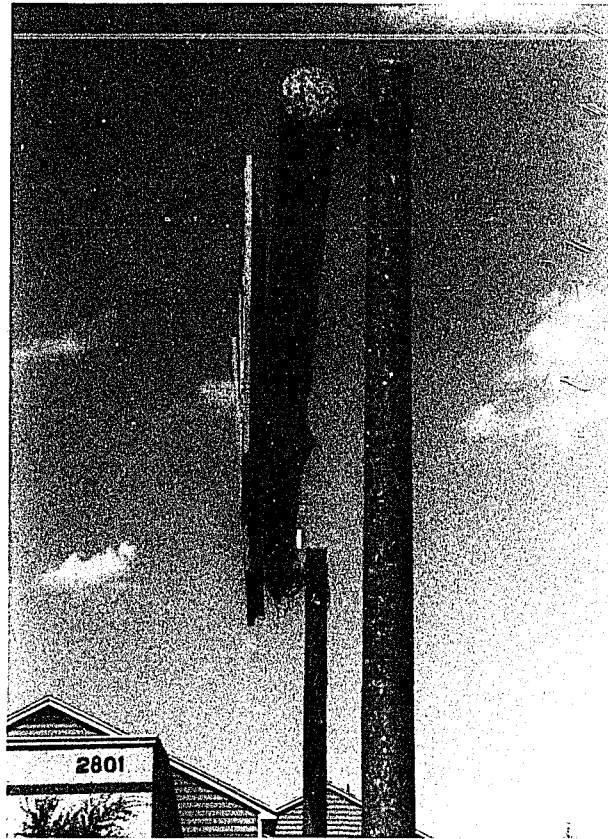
Beam-to-Column Connection for Tucson Monotube Structure
